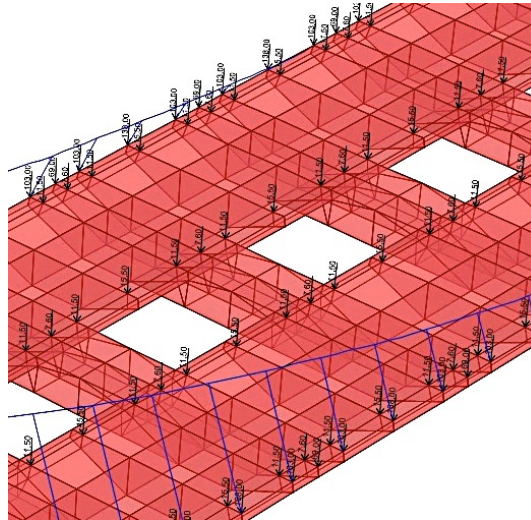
Non-structural elements loading in SAP2000 models.
